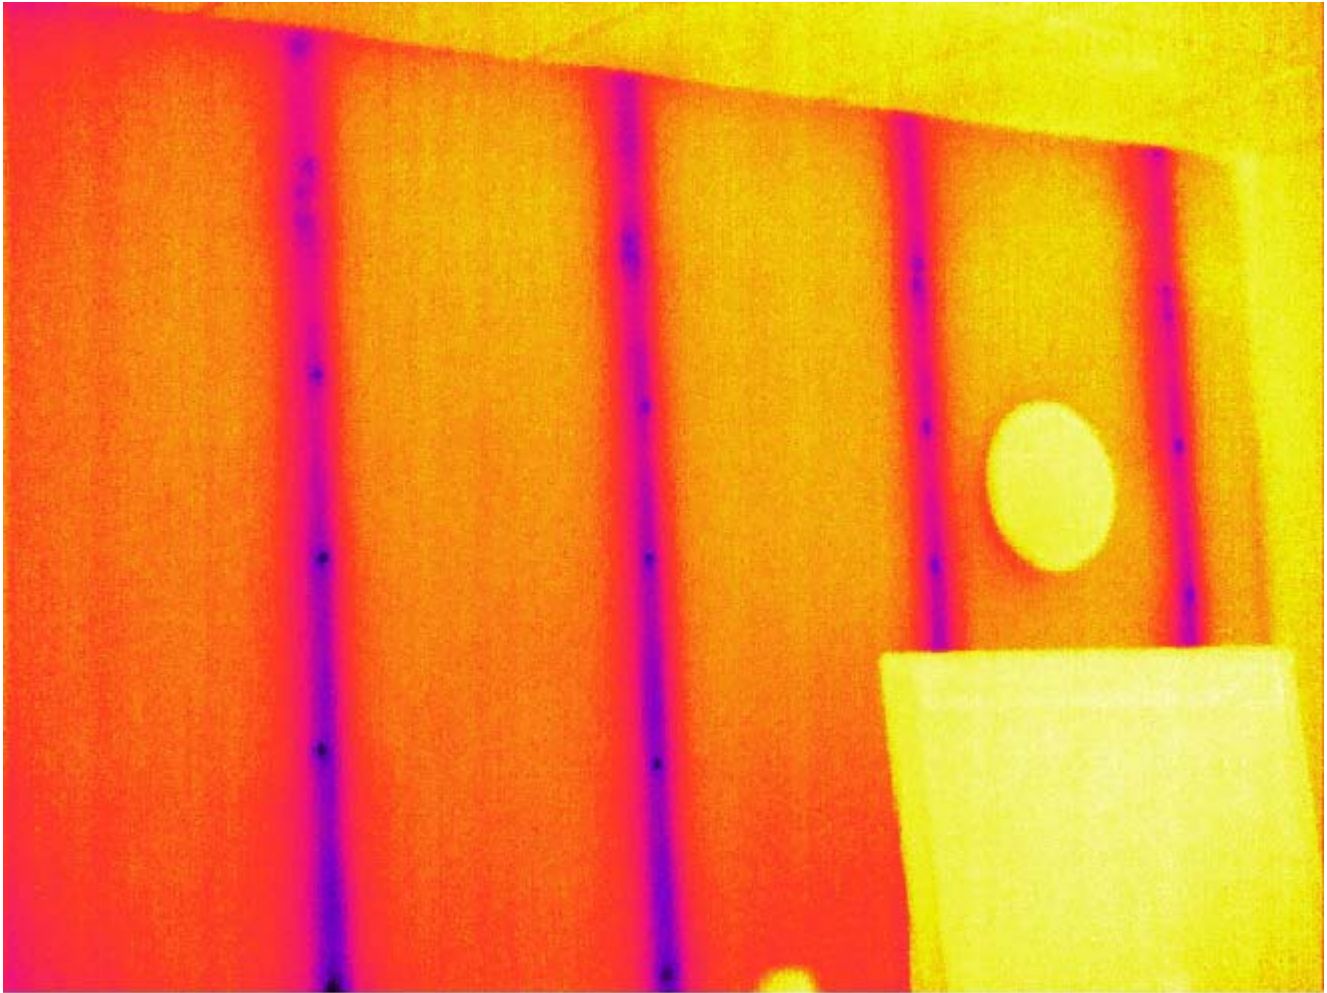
Infrared Thermograph of an interior wall, showing the thermal bridging impact of fasteners and studs.
